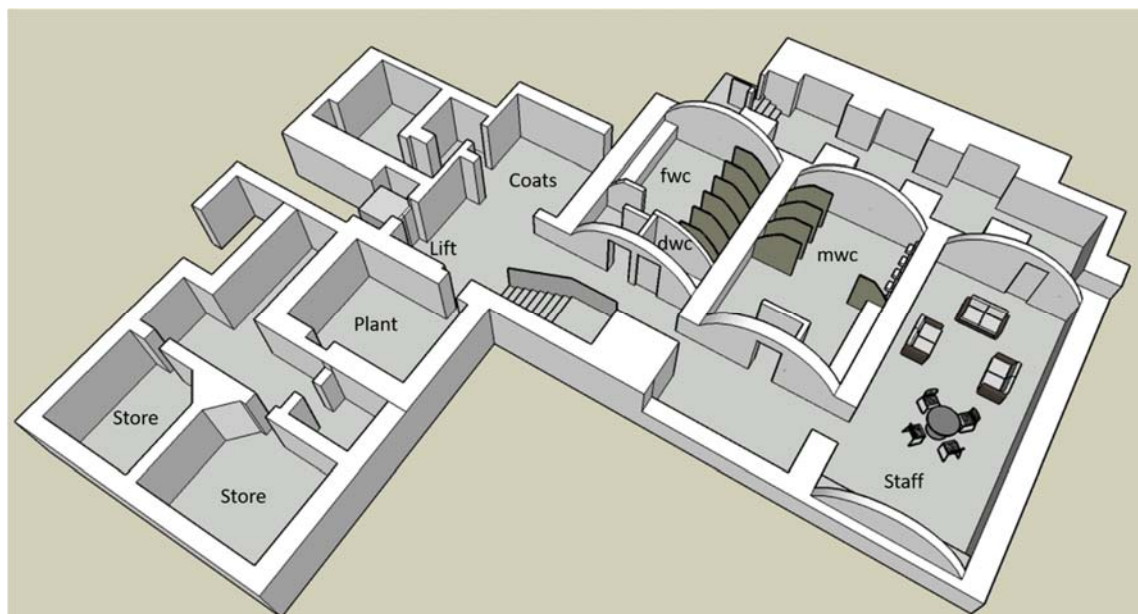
The Basement - refurbished to provide a cloakroom, toilets and staff facilities
